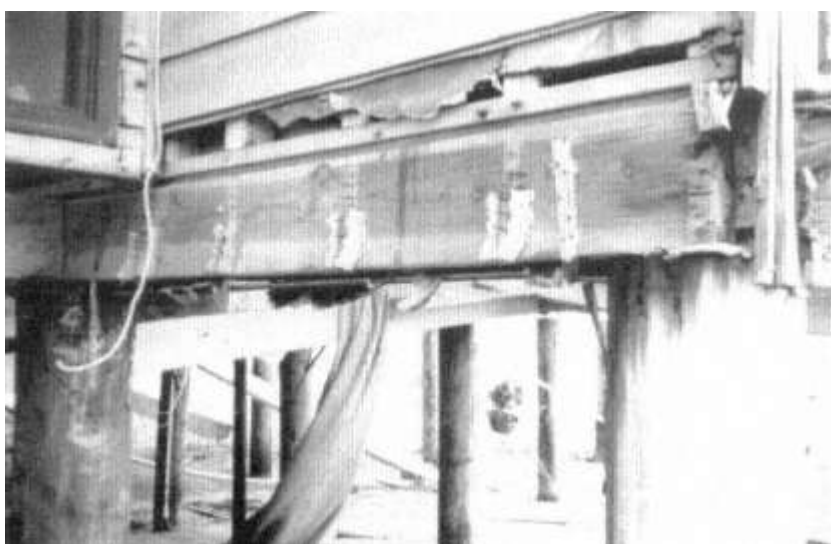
Inadequate and improper nailing caused the floor joist to separate from floor beams.
